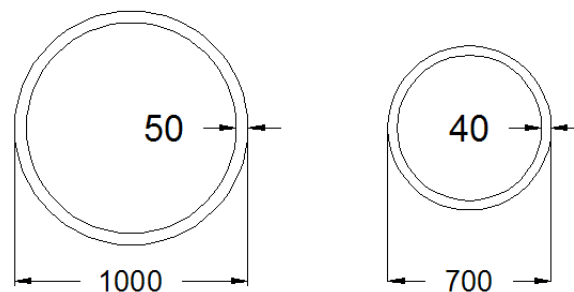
Dimensions of the breasting (l) and mooring dolphin (r) of the inland basin in mm
